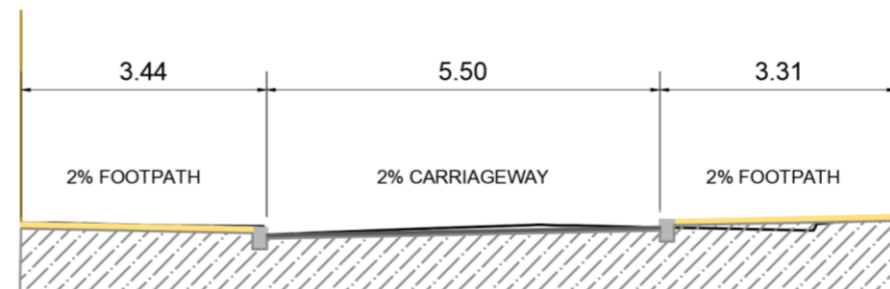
Typical Cross Section of Gladstone St North (from Junction with Mary St. Car Park to Junction with Kickham St.)
